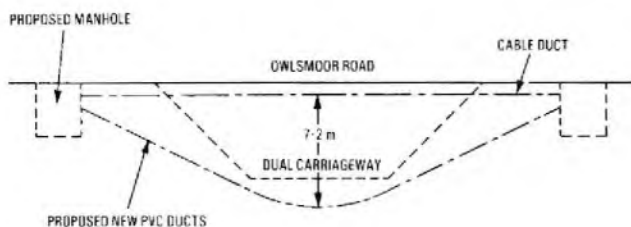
Elevation of Owlsmoor road with proposed new road cutting through it
